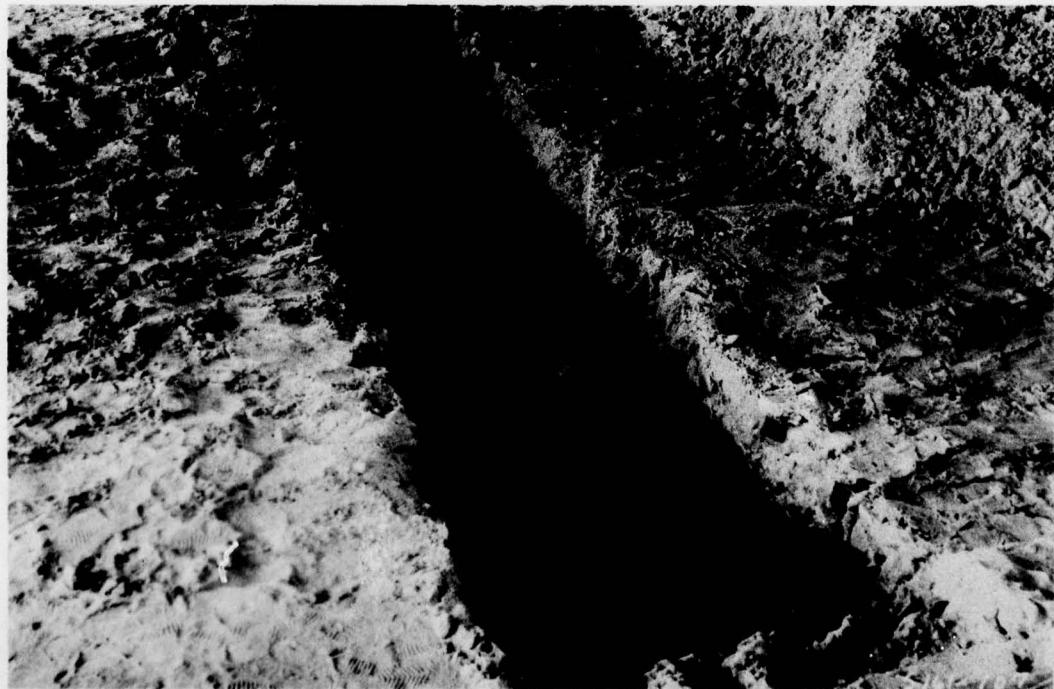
Test Section No. 3, item 2, trench after 200 coverages
